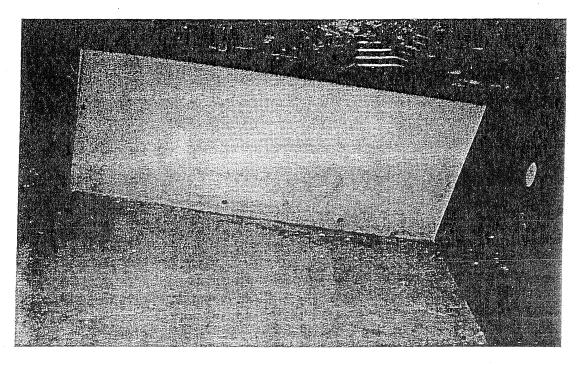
3TS5, Below Fire Sprinkler Equipment, North of Elevator Shaft. Vinyl base was pulled at multiple locations in 3TS5 where there were any signs of recurring water damage. The inspection revealed mold throughout the room. The majority of this damage has resulted over time from testing, maintenance, and repair of fire pumps and sprinkler systems.
